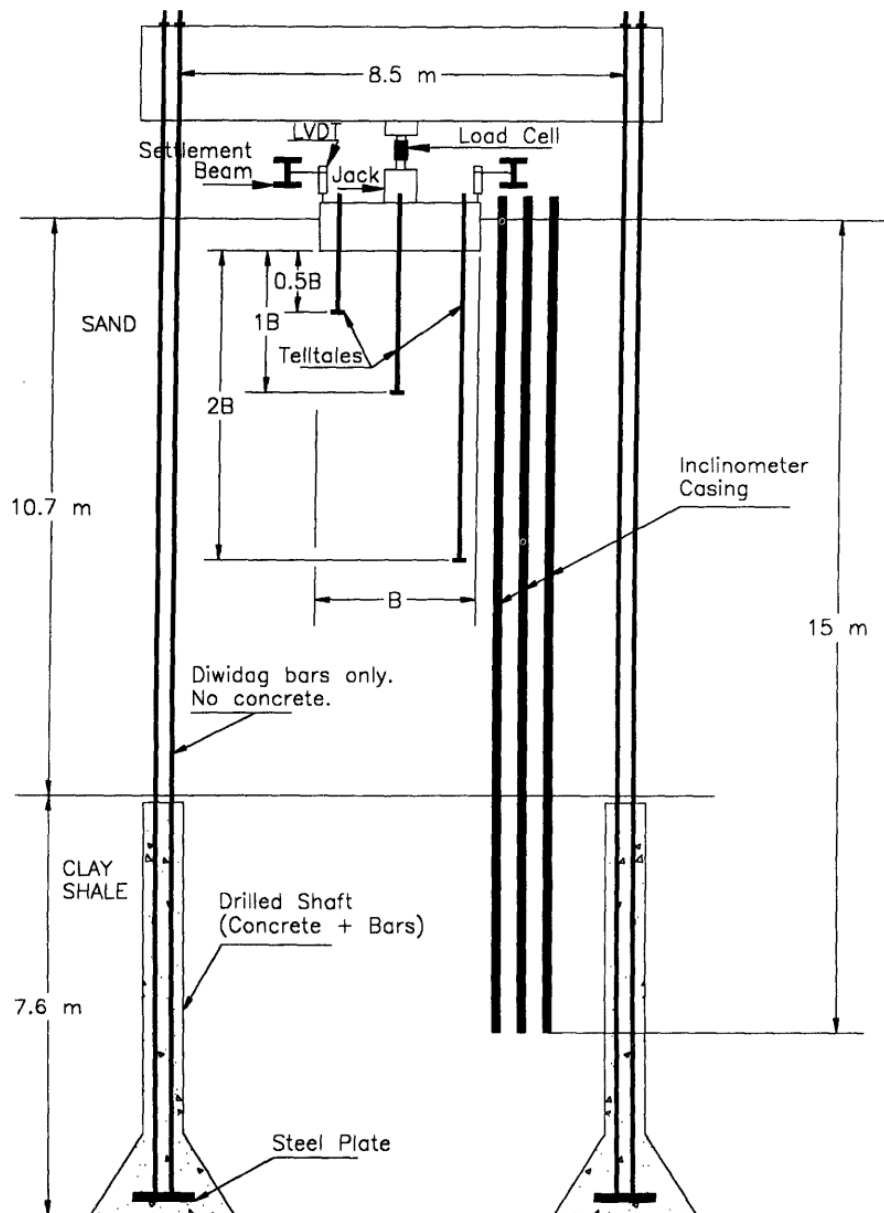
A typical load setup at Texas A&M footing load test site(Briaud and Gibbens 1997).
